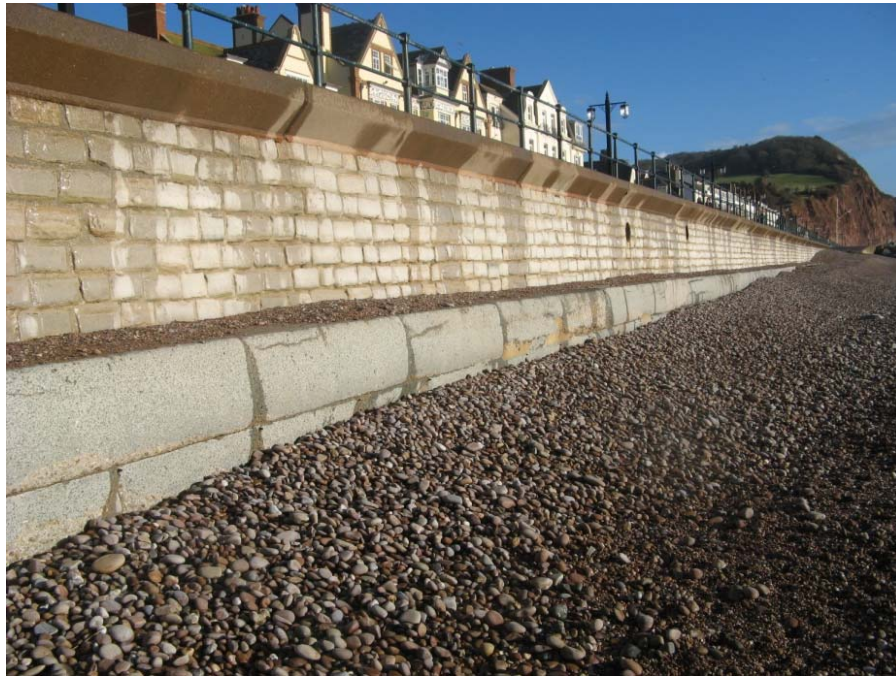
Frontage 4 seawall and concrete apron with shingle beach
